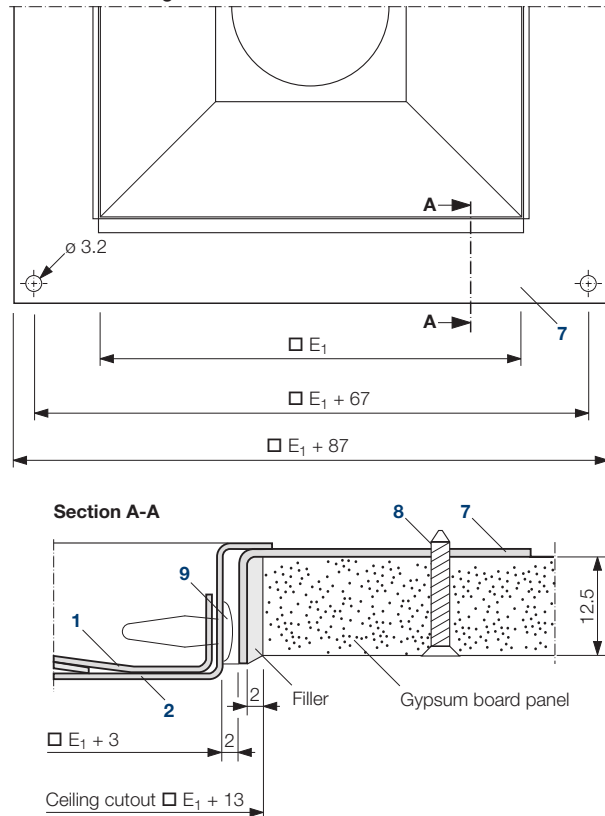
Detail OC-Q gypsum plasterboard ceiling installation frame
